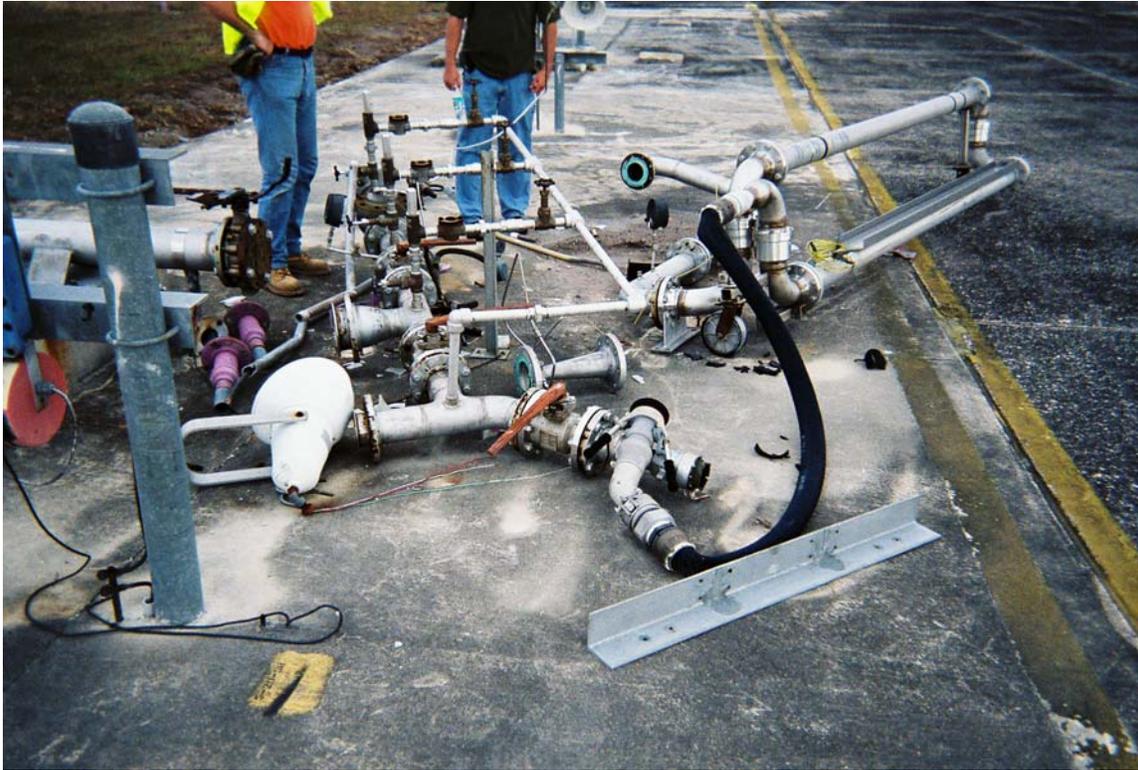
View of dismantling piping and equipment at aircraft fueling station
